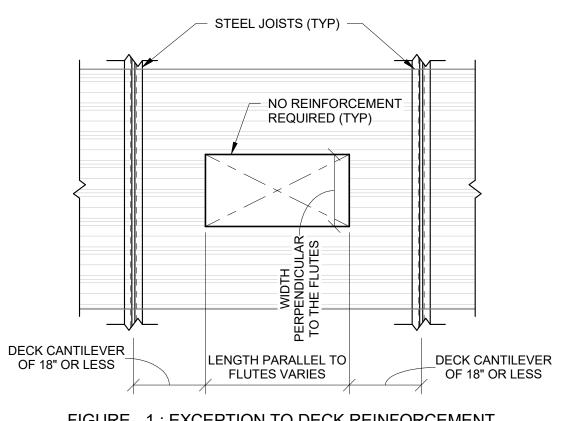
EXCEPTION TO DECK REINFORCEMENT
